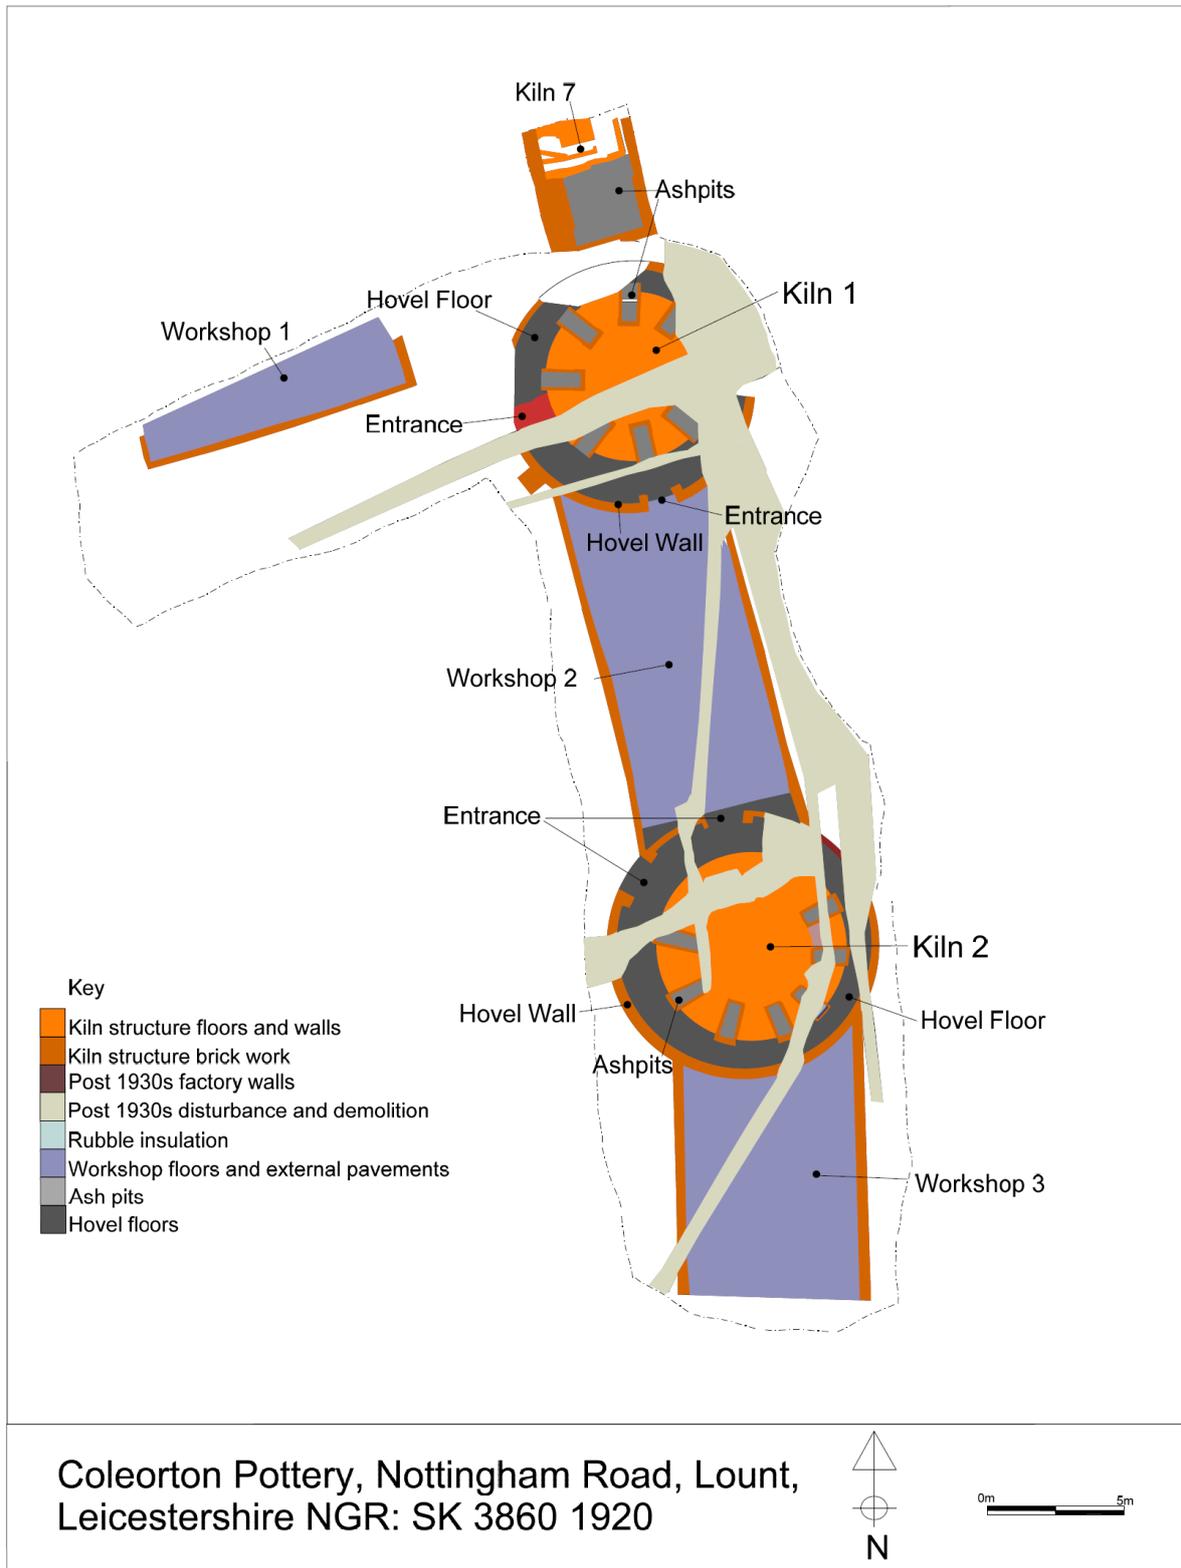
Plan of Kilns 1 and 2 with Workshops 1, 2 and 3.
